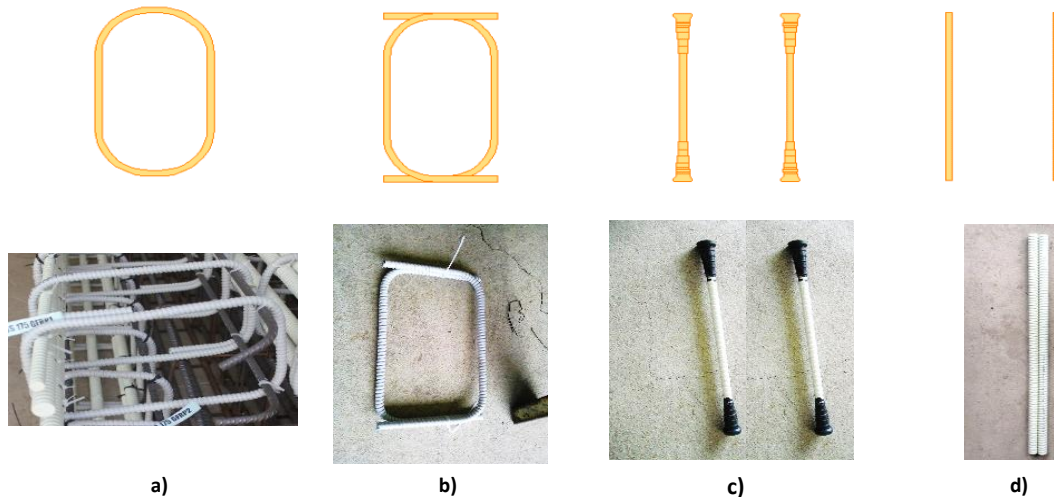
GFRP shear reinforcement proposed and tested solutions
